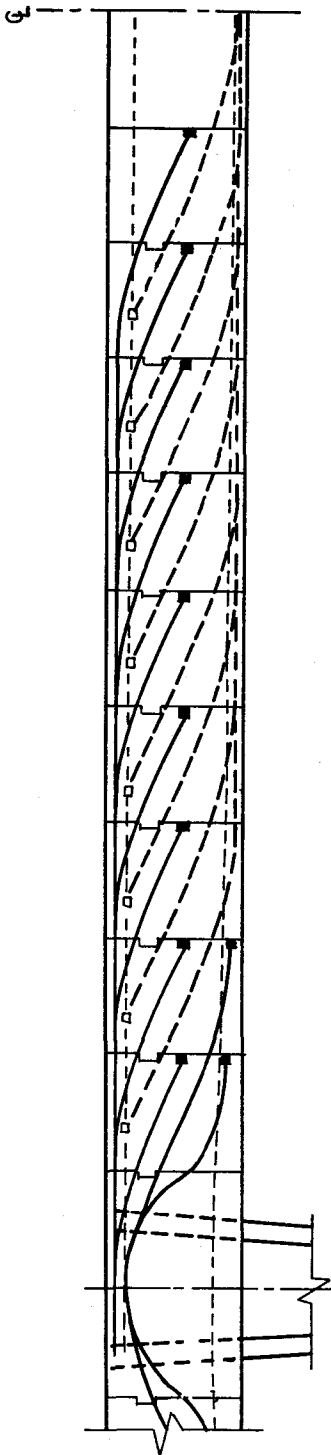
Longitudinal cable profile for Choisy-le-Roi Bridge
